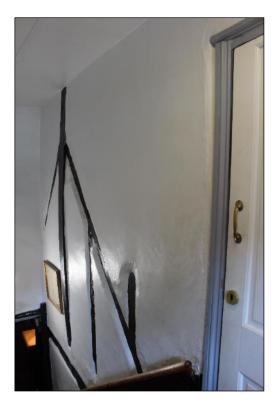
Detail of exposed timber framing/ roof truss within the northern wall of the stairwell.
